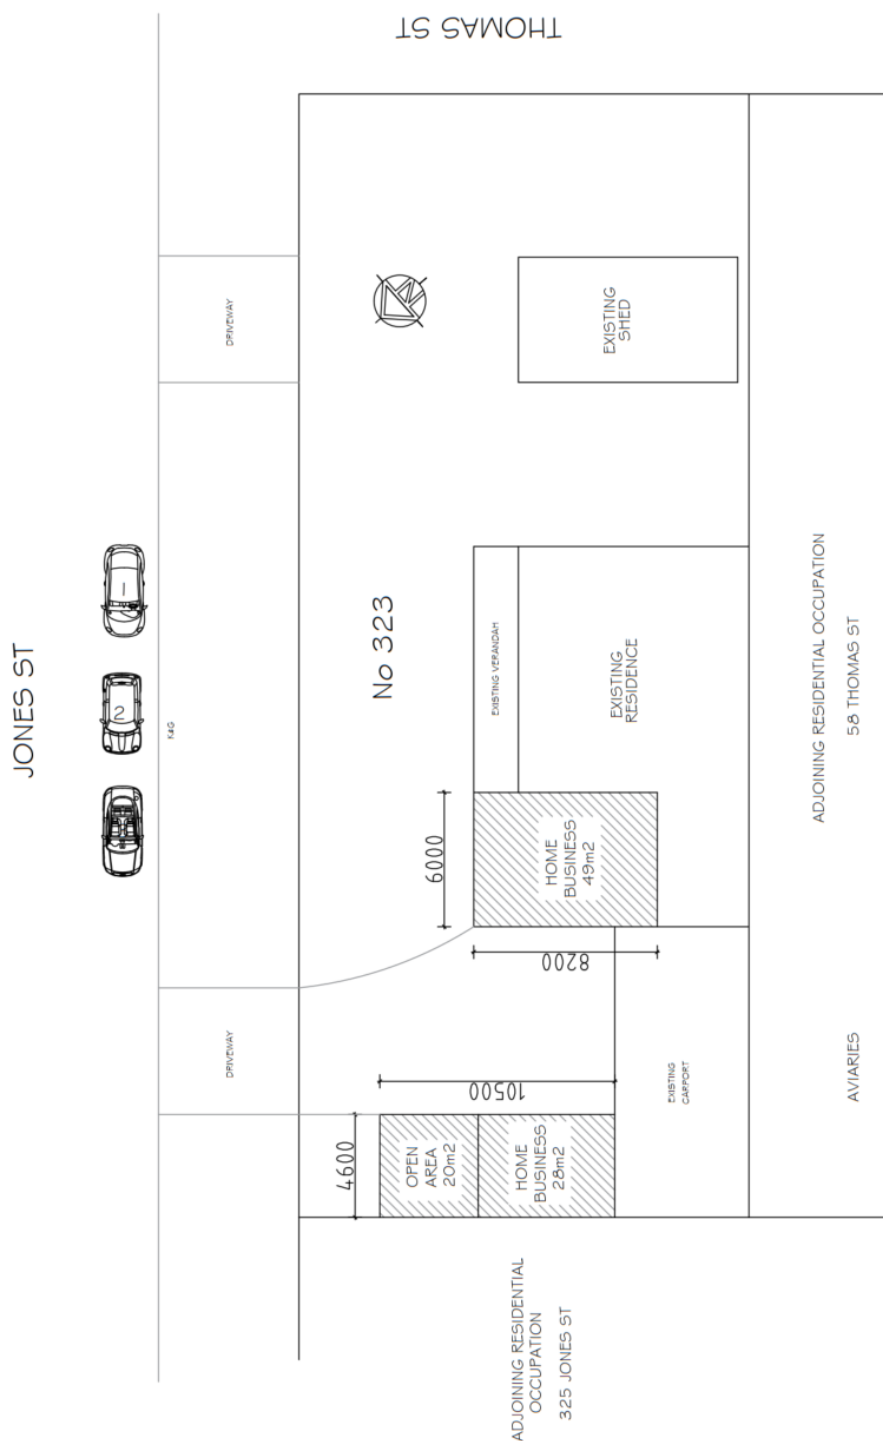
Proposed site plan with the hatching indicating the proposed areas to be used for the home business. As outlined above, Area 1 is 49sqm and Area 2 is 28sqm.
